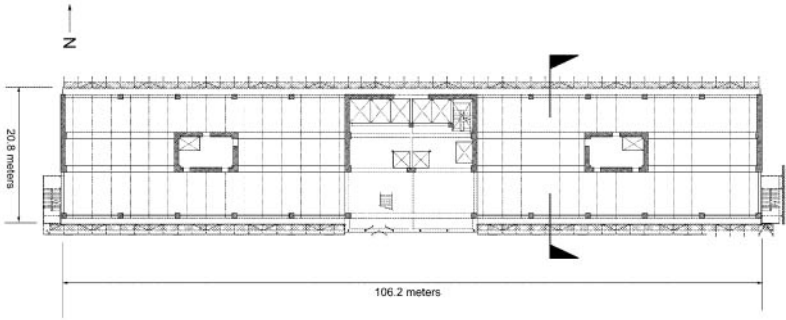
Typical floor plan in the tower: The shear walls and exterior columns were located to maximize the bay sizes. (Graphic courtesy of Steve Ratchye)
